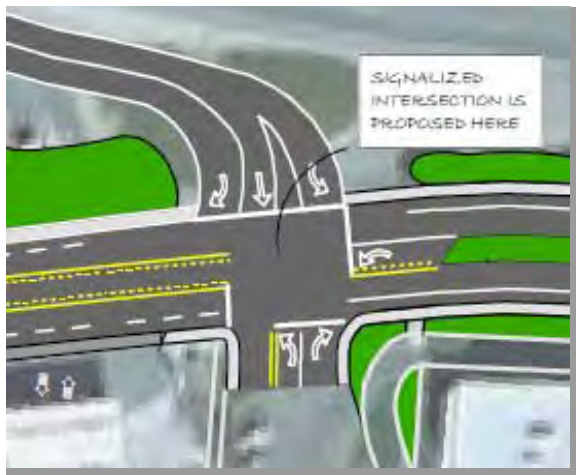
Recommended US 50 Broadway off ramp design and intersection
